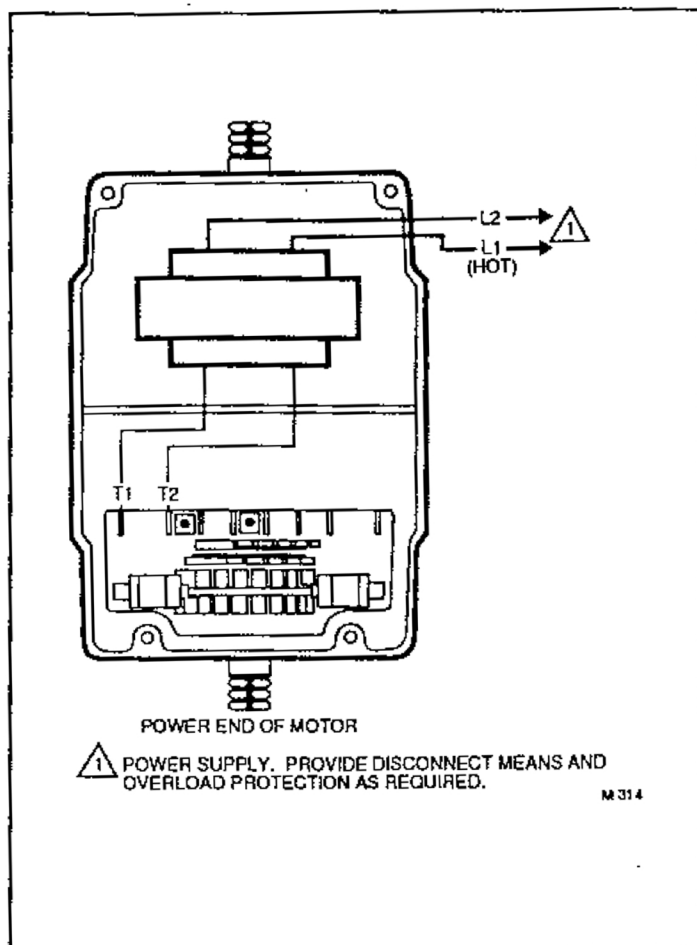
Mounting 198162 transformer in Modutrol IV motor.
